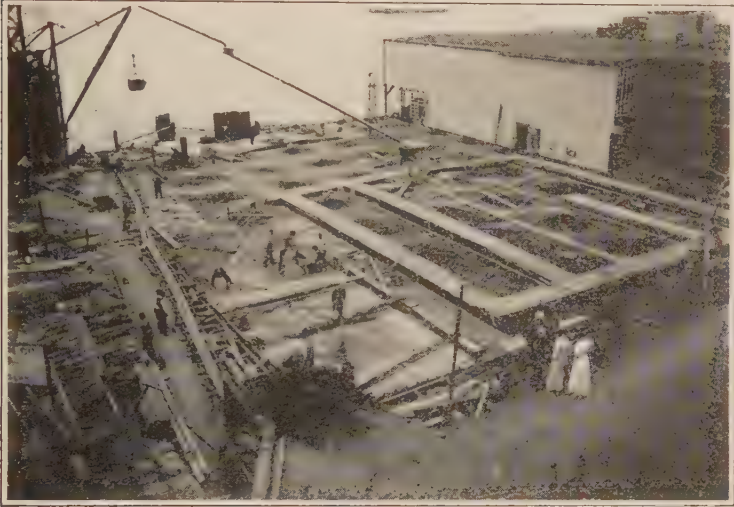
GENERAL VIEW OF FIRST FLOOR.
